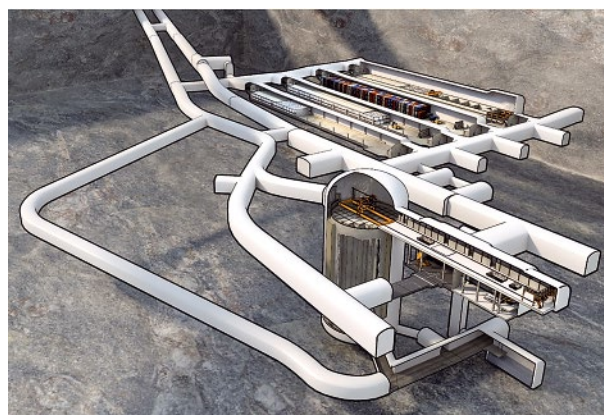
SFR design layout – underground disposal facility in the vicinity of Forsmark NPP [17]
